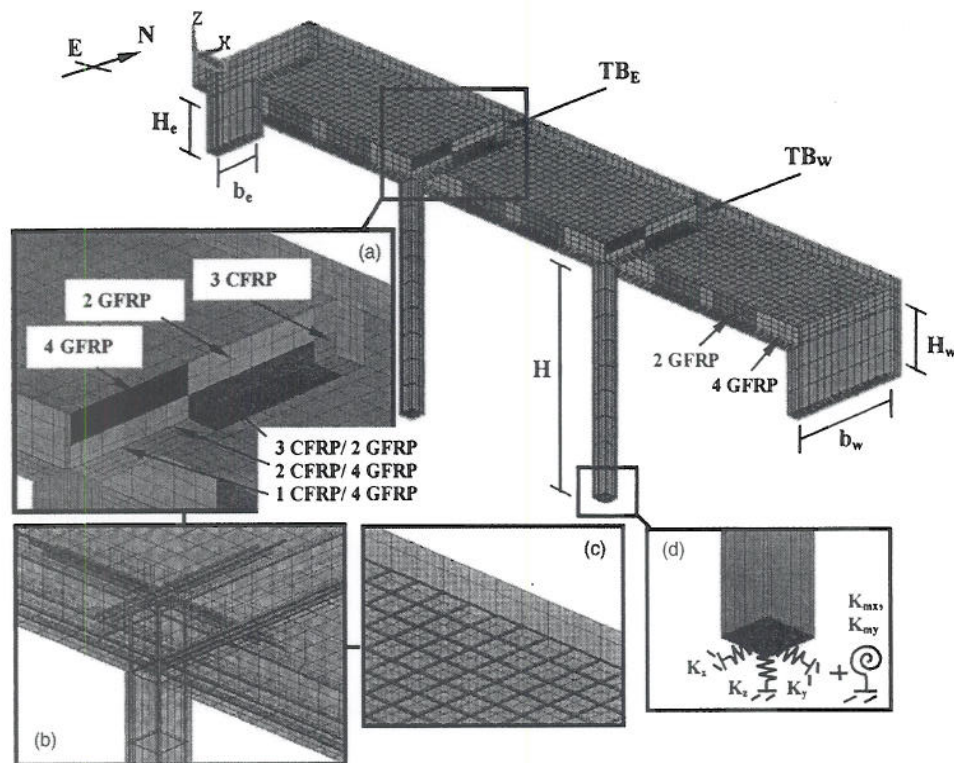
Finite element bridge modeling: (a) typical fiber-reinforced polymer reinforcement; (b) typical steel reinforcement in beams and columns; (c) typical steel reinforcement in bridge deck; and (d) typical soil–structure interface modeling
